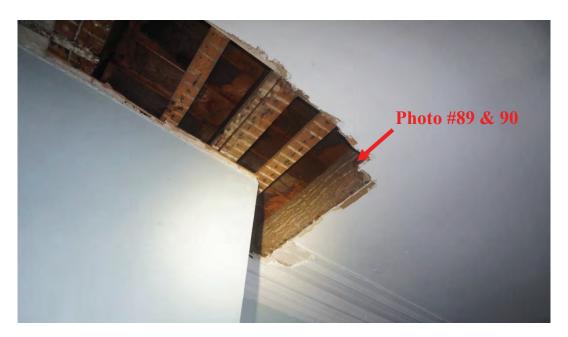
Ceiling joist that was never fully scored into a square framing member and still has bark exterior (Probe #4).
